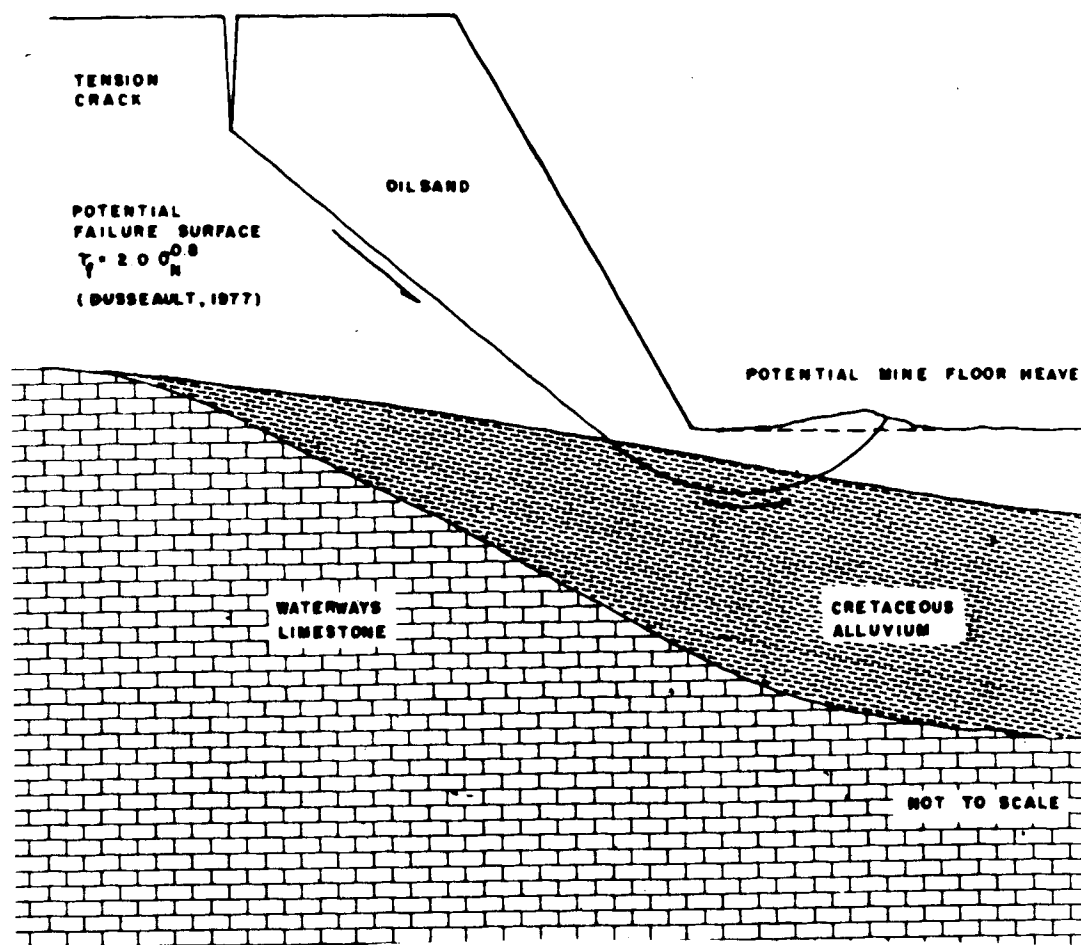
POTENTIAL HIGHWALL INSTABILITY AND MINE FLOOR HEAVE IN BASAL McMURRAY ALLUVIUM
